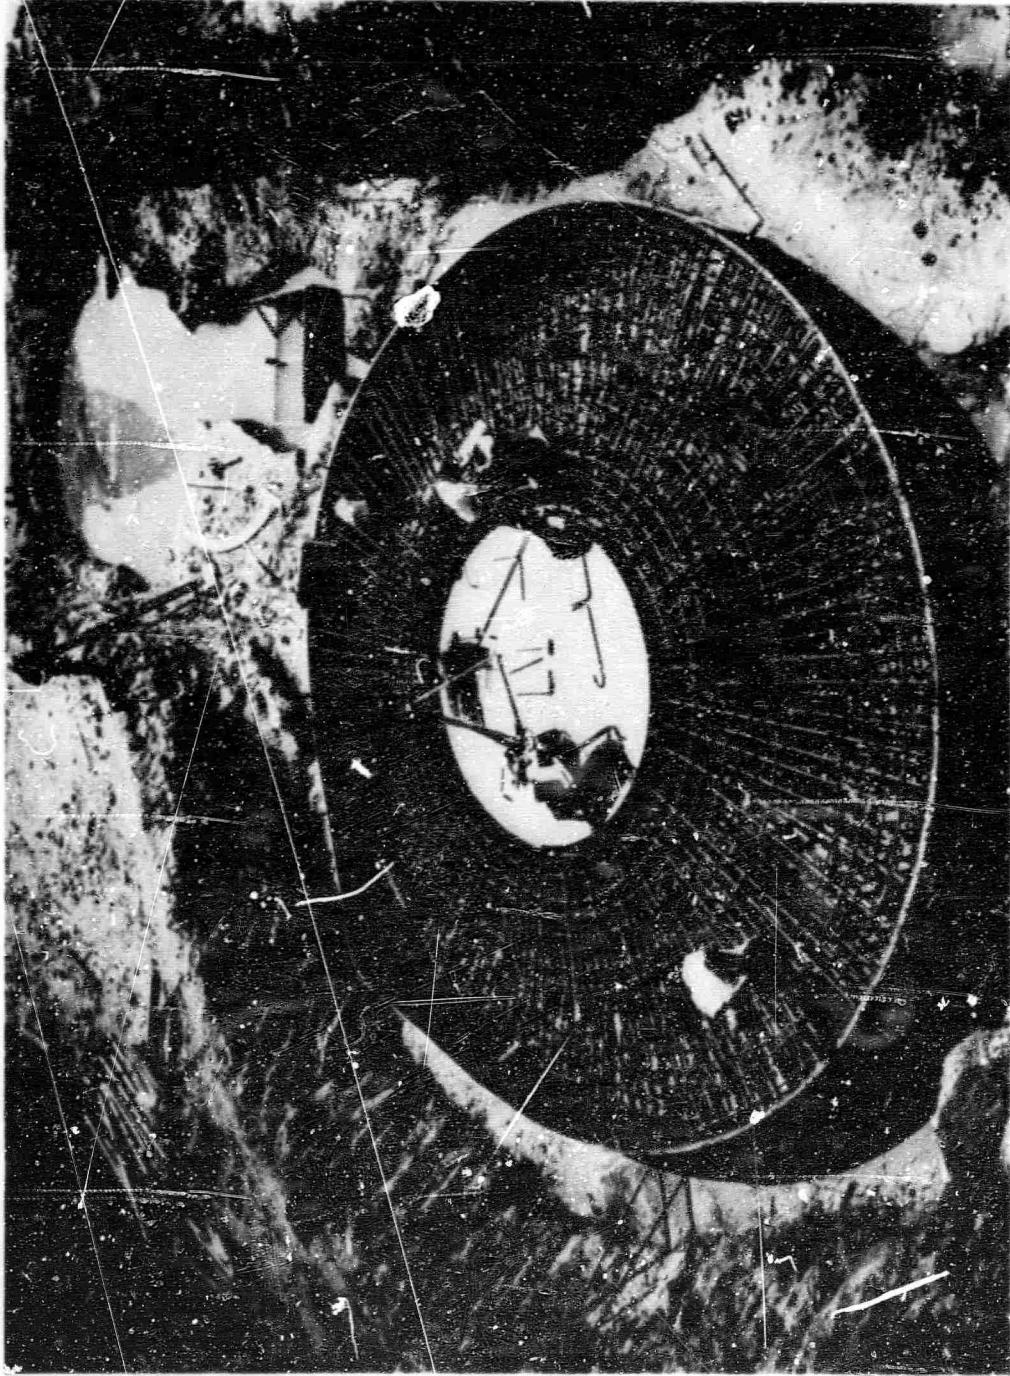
Excavation for Minuteman air-shaft structure filled with seepage water
